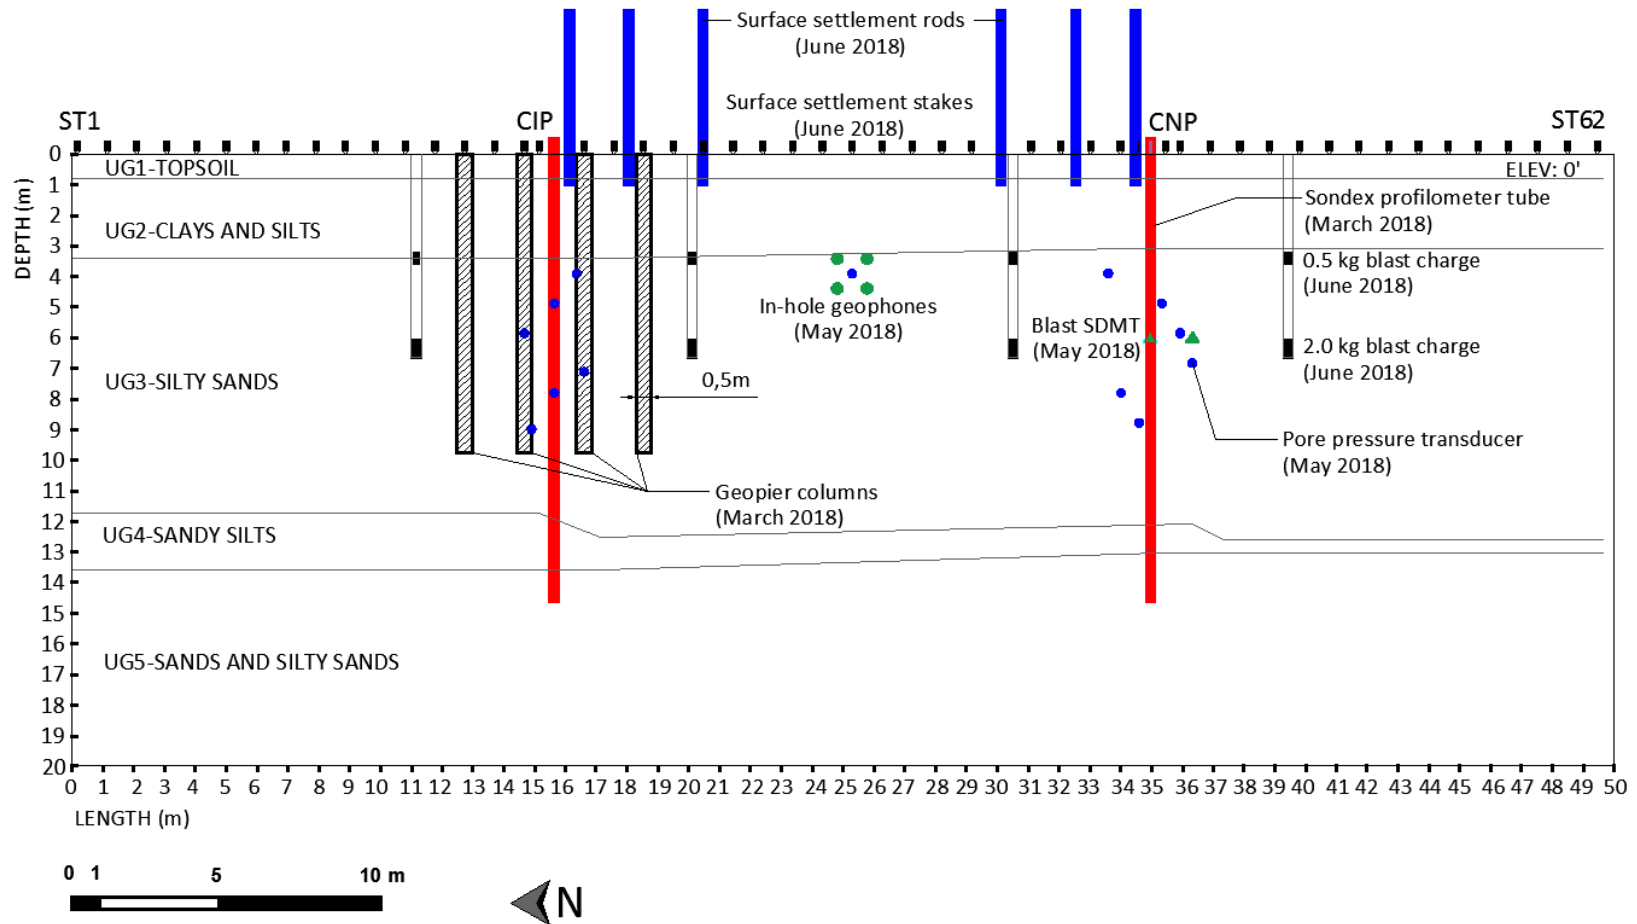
Simplified soil profile section B-B' showing the relative positions of the Improved Panel (IP) and the Natural Panel (NP), RAP column positioning, blast holes and other instrumentation at the site.
